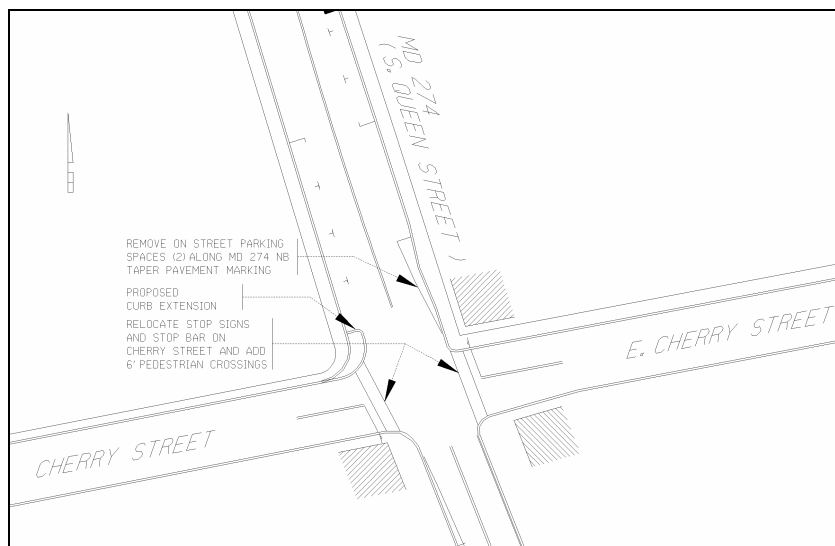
Proposed Curb Extensions, Crosswalks, and pavement markings
